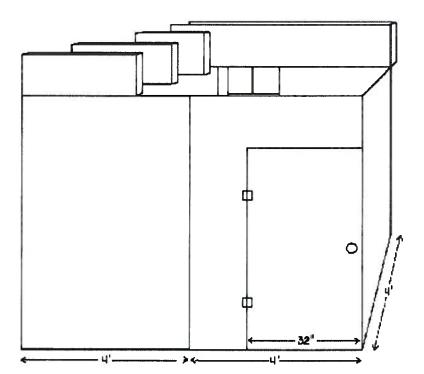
A basement storage area in the corner of a basement with a window. Walls are three sheets of 4 x 8-foot 3/8-inch plywood. Cut a 7-foot x 32-inch door in one sheet. Insulate the ceiling and interior walls. Build shelves and bins around all walls inside the storage area. Leave a small walkway near the door.
